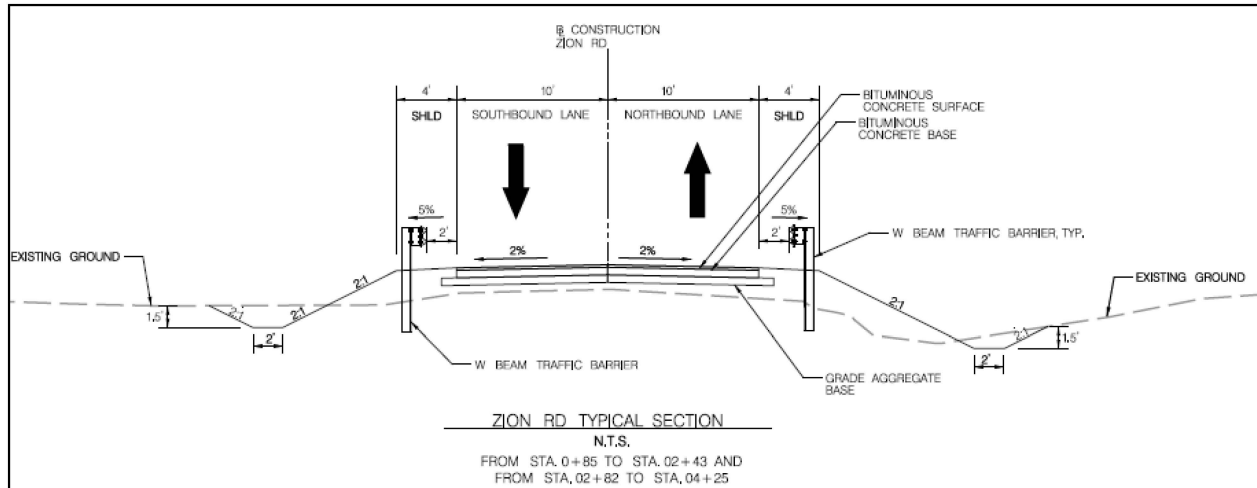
Cross Section for Bridge Approach (Traffic Barrier with Steep Slopes)
